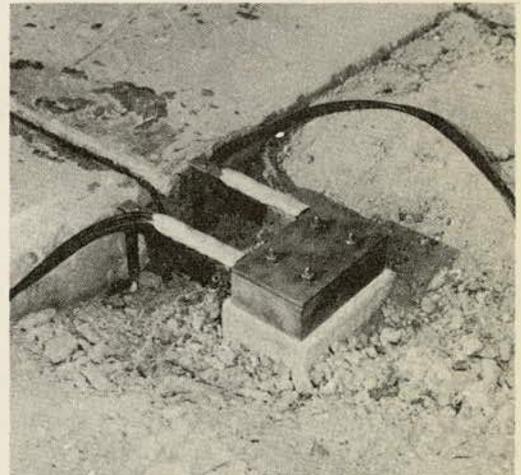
Electrical deflection-measuring device at corner of pavement slab.
